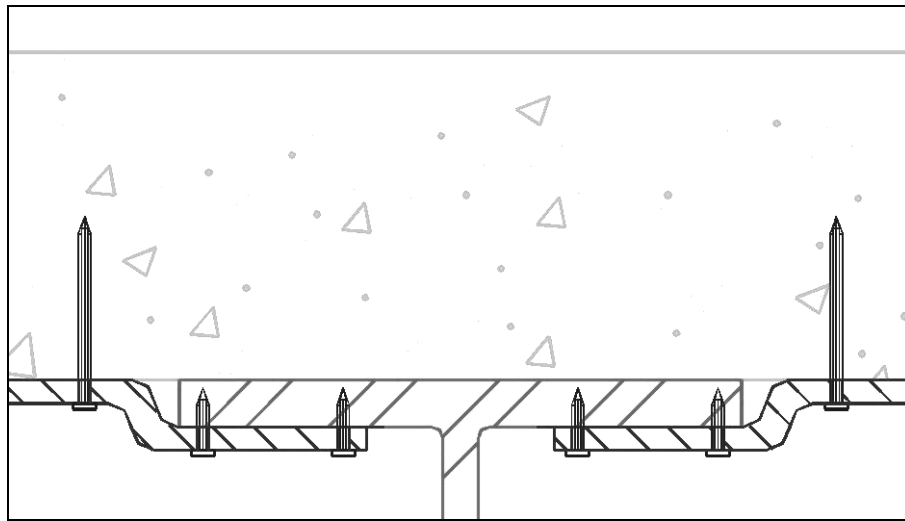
Potential application of Powder-Actuated Fasteners in bridge retrofitting
